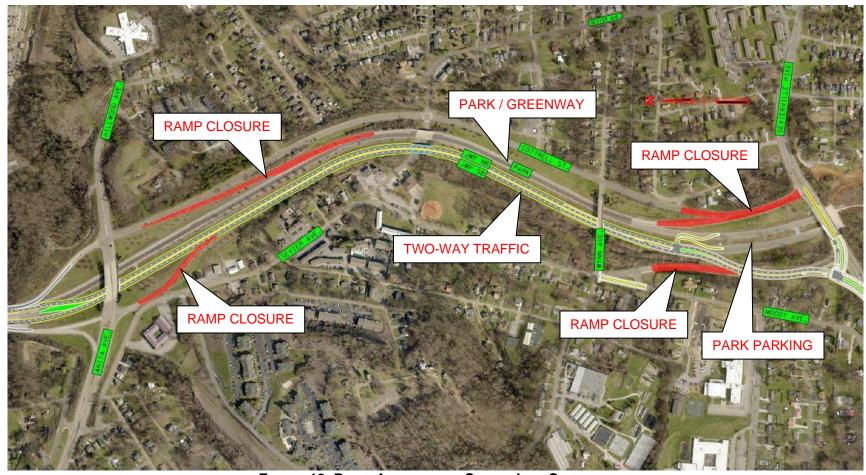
BUILD ALTERNATIVE SINGLE-LINE SKETCH
